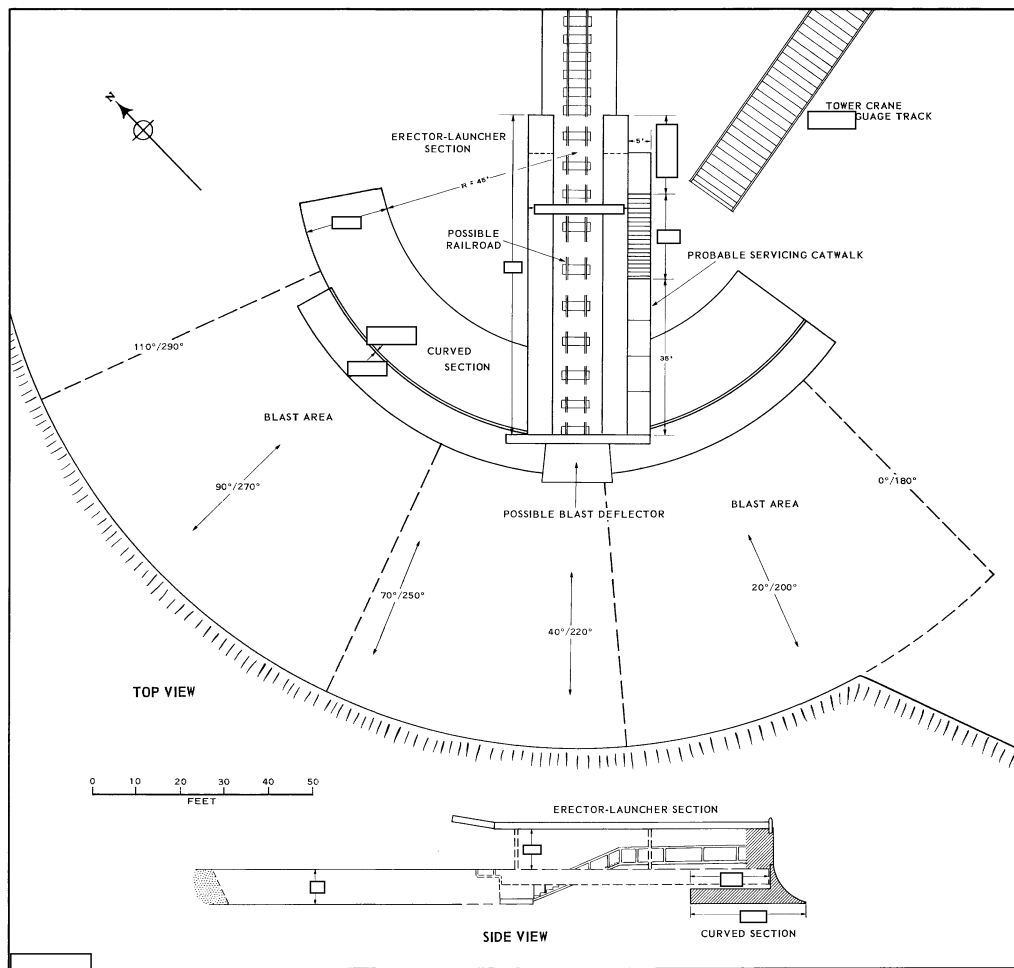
TWO VIEWS OF THE RAIL-SERVED LAUNCH STRUCTURE AT LAUNCH SITE 1D.
